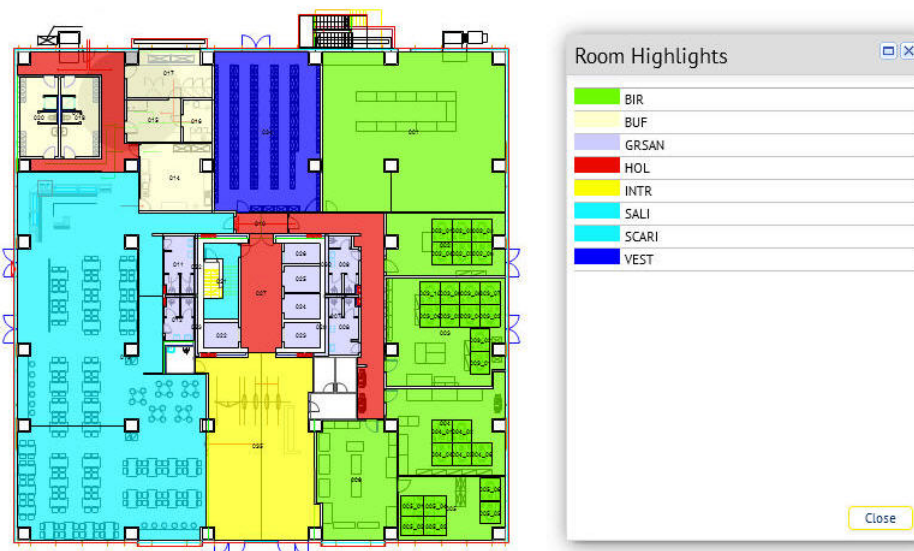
MultiGalaxy building, ground floor, space structure according to SR 1907-2
